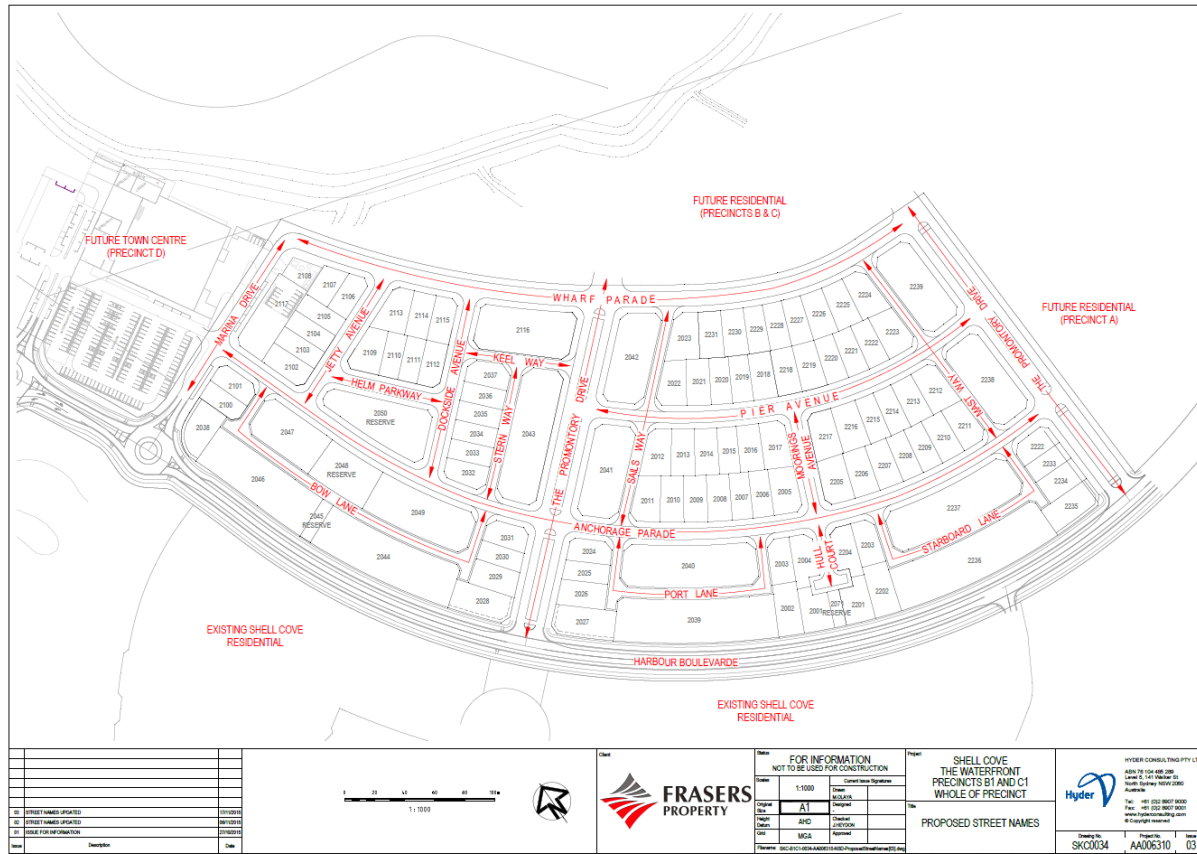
Subject Site (unregistered lots 2236 and 2237)
